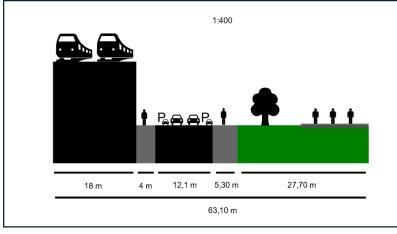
and 23.2: Street space allocations Dircksenstraße. Author (2024)
